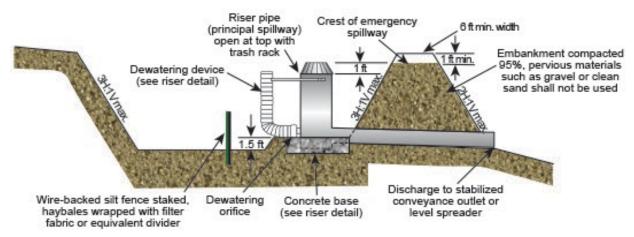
Sediment basin plan cross section (Washington State Department of Ecology 2012).
